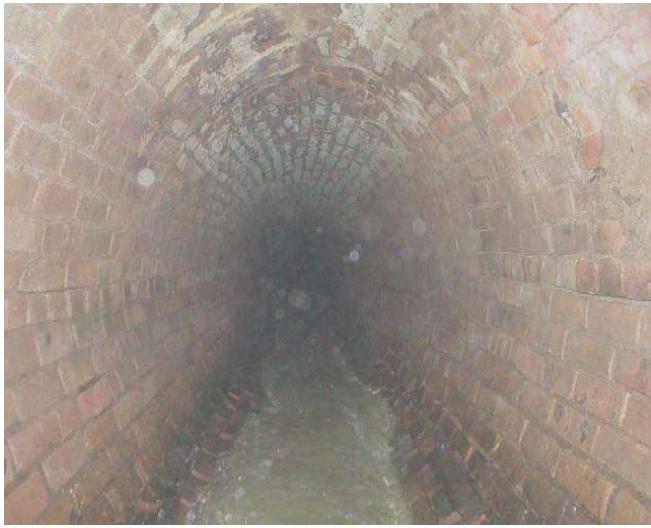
Example of Condition Grade 1 Brick Sewer - Acceptable Condition
